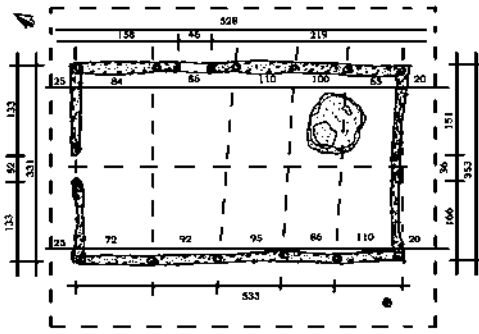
The plan of the prehistoric house reconstructed in the new experiment from Sultana-Malu Roşu (scale 1:50).
